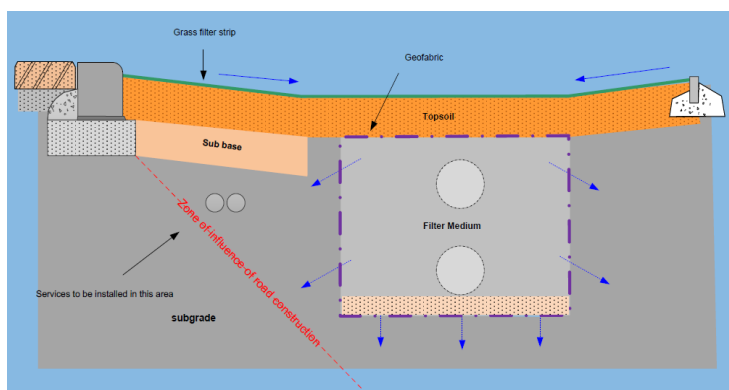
Cross-section of typical filter drain & infiltration trench
